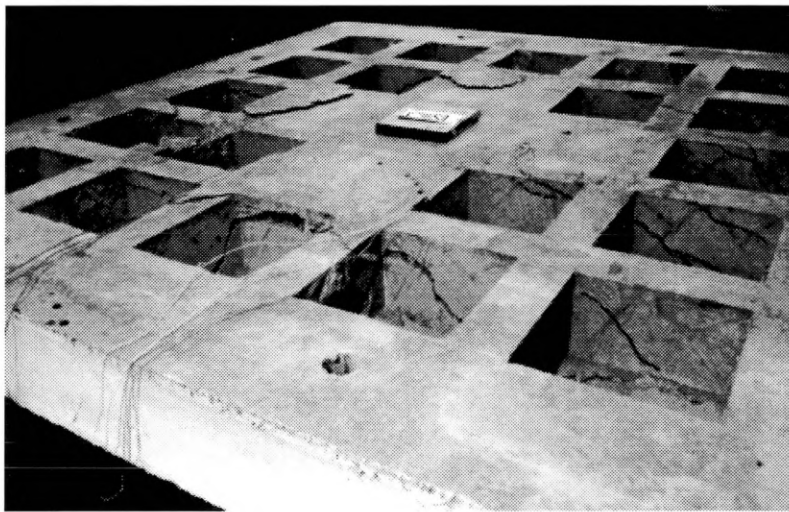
(k) Crack pattern after punching failure — slab No. 11
